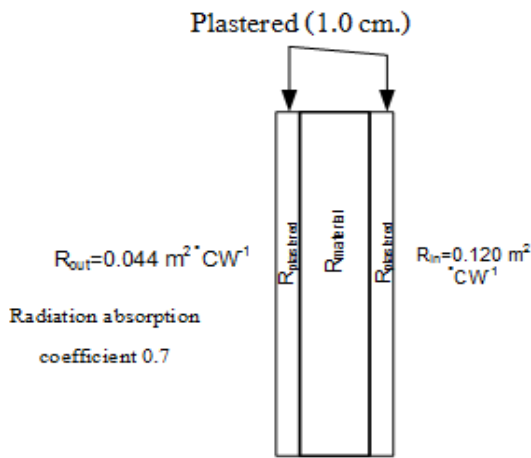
Wall model for 2-sided plastered wall with 1 type of masonry.
